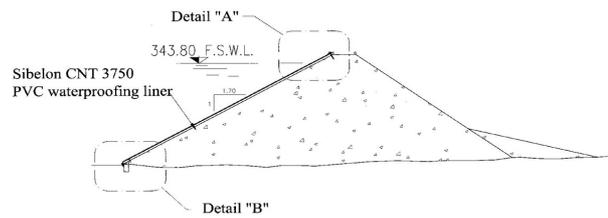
Cross-section of Winscar dam. The waterproofing liner is installed in exposed position on the upstream face.
